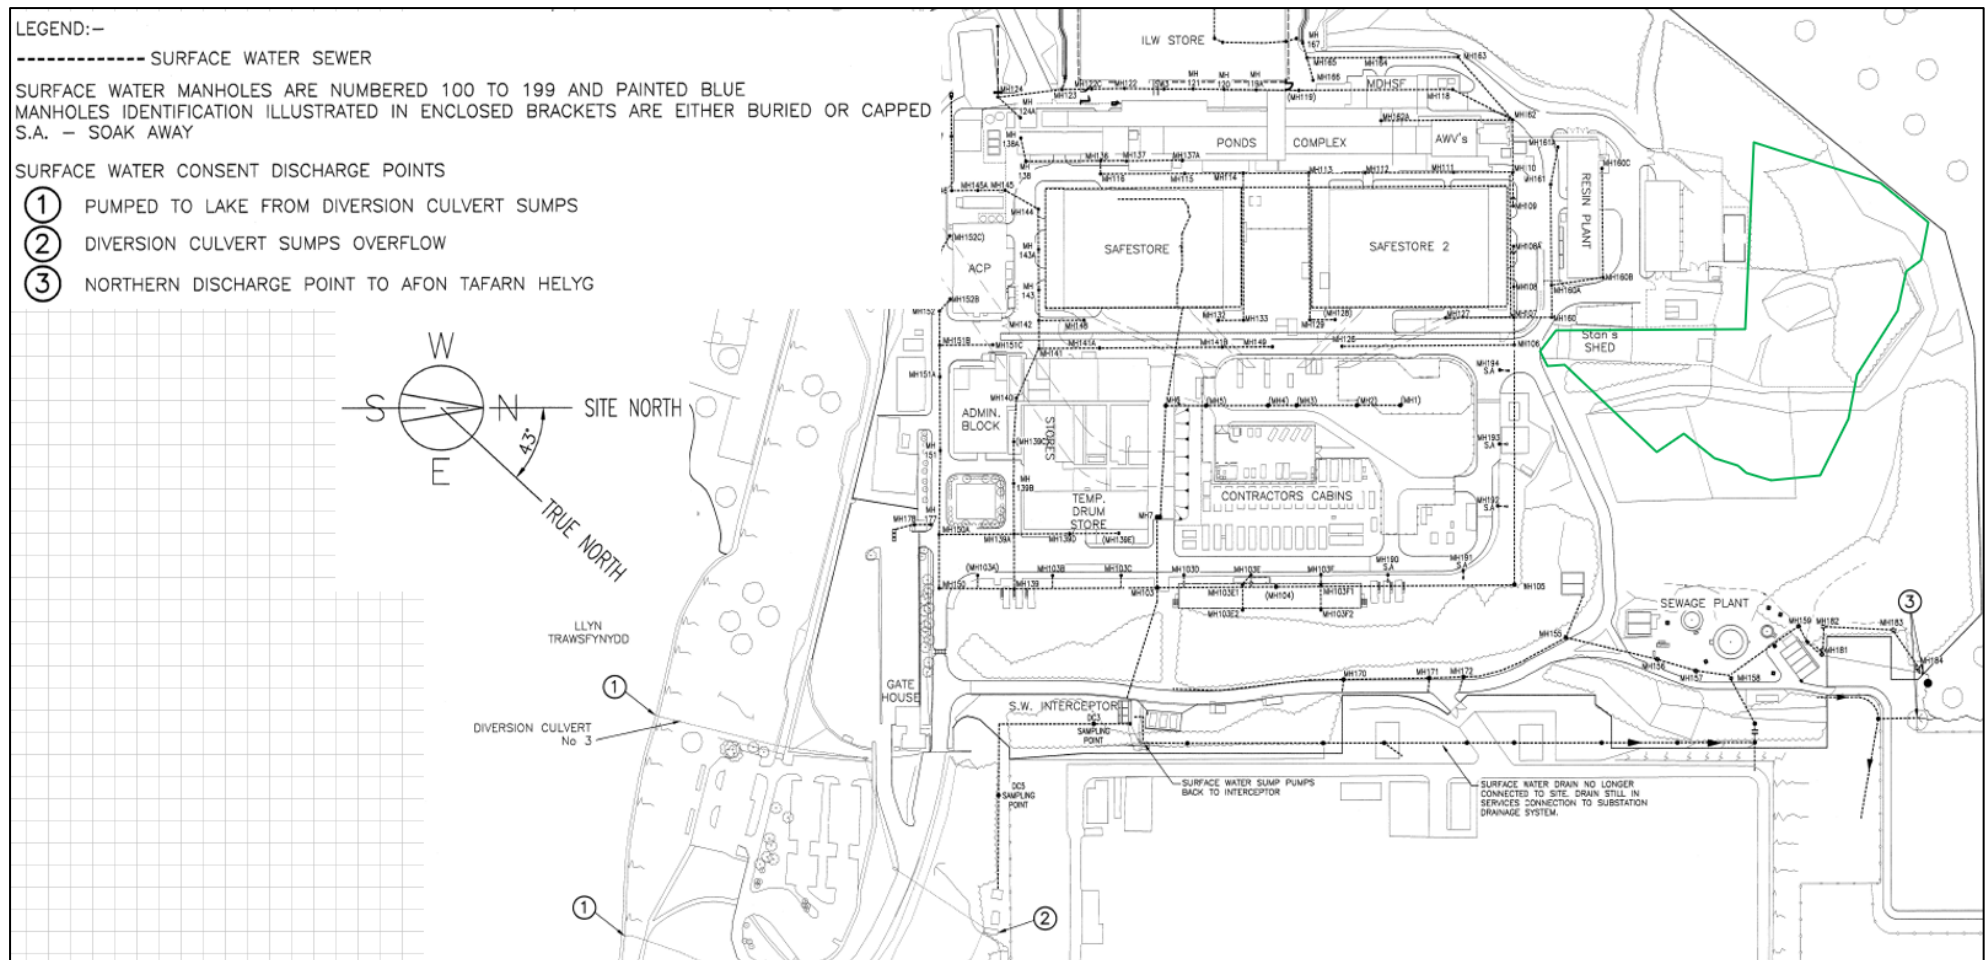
Site layout plan showing DfR area (green polygon) in relation to the site surface water drainage system
